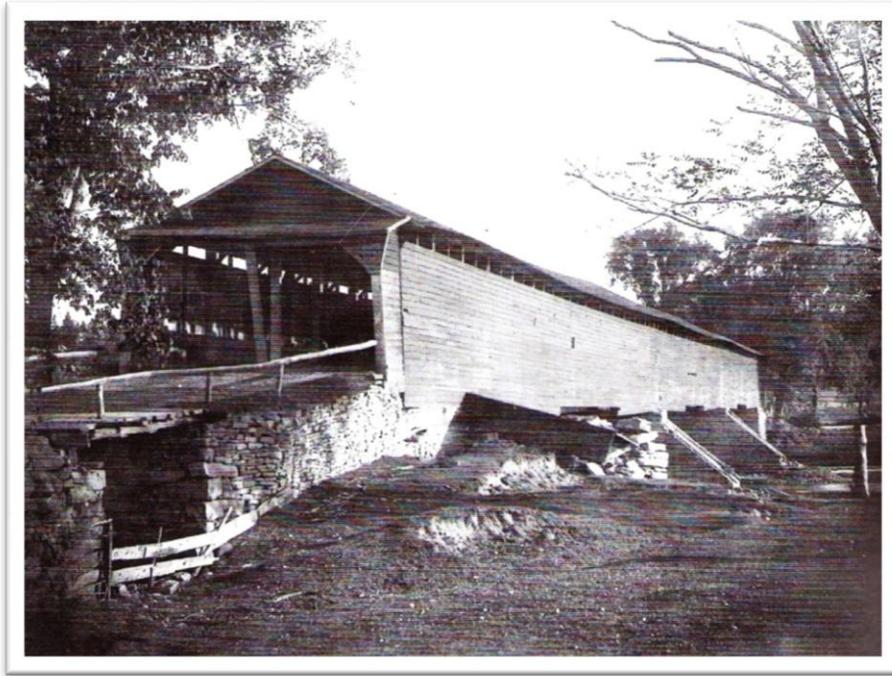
Fish House Bridge over the Sacandaga River, built 1814-1818
